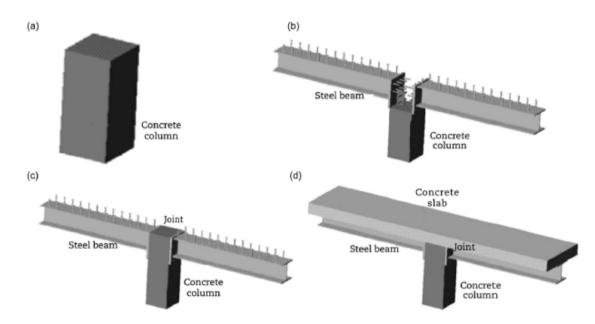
Assembly phases. (a) Concrete column. (b) Steel beam. (c) Concrete joint. (d) Concrete slab.
